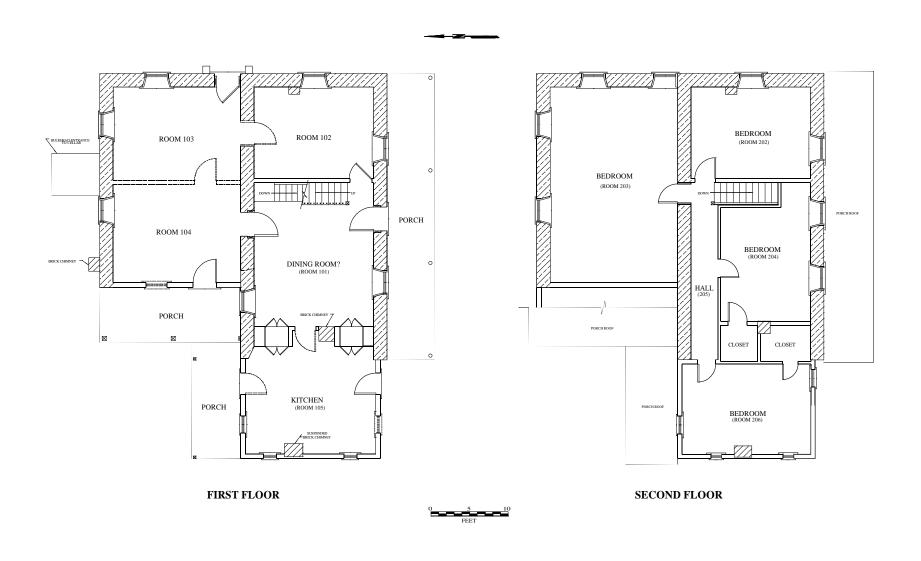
First and second floor plans of the Howarth House, showing the construction of the west frame wing (circa 1900-1910).
